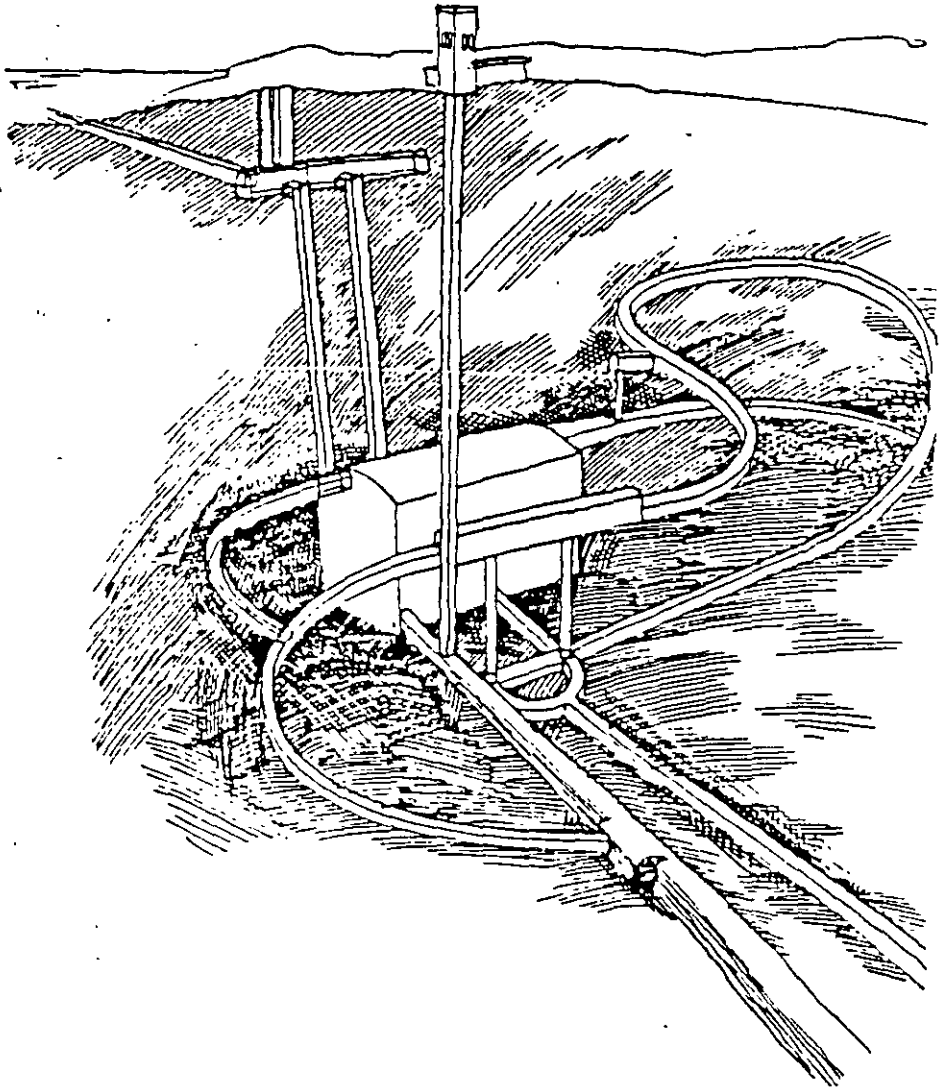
Typical tunnel system in a hydroelectric power plant.
